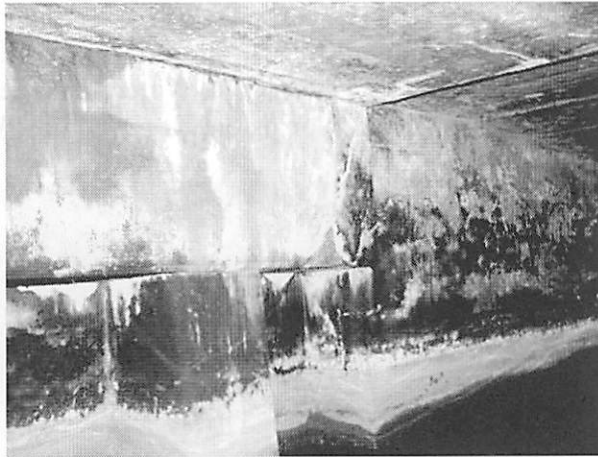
Rust color as well as spalling has found in cap beam and slab
